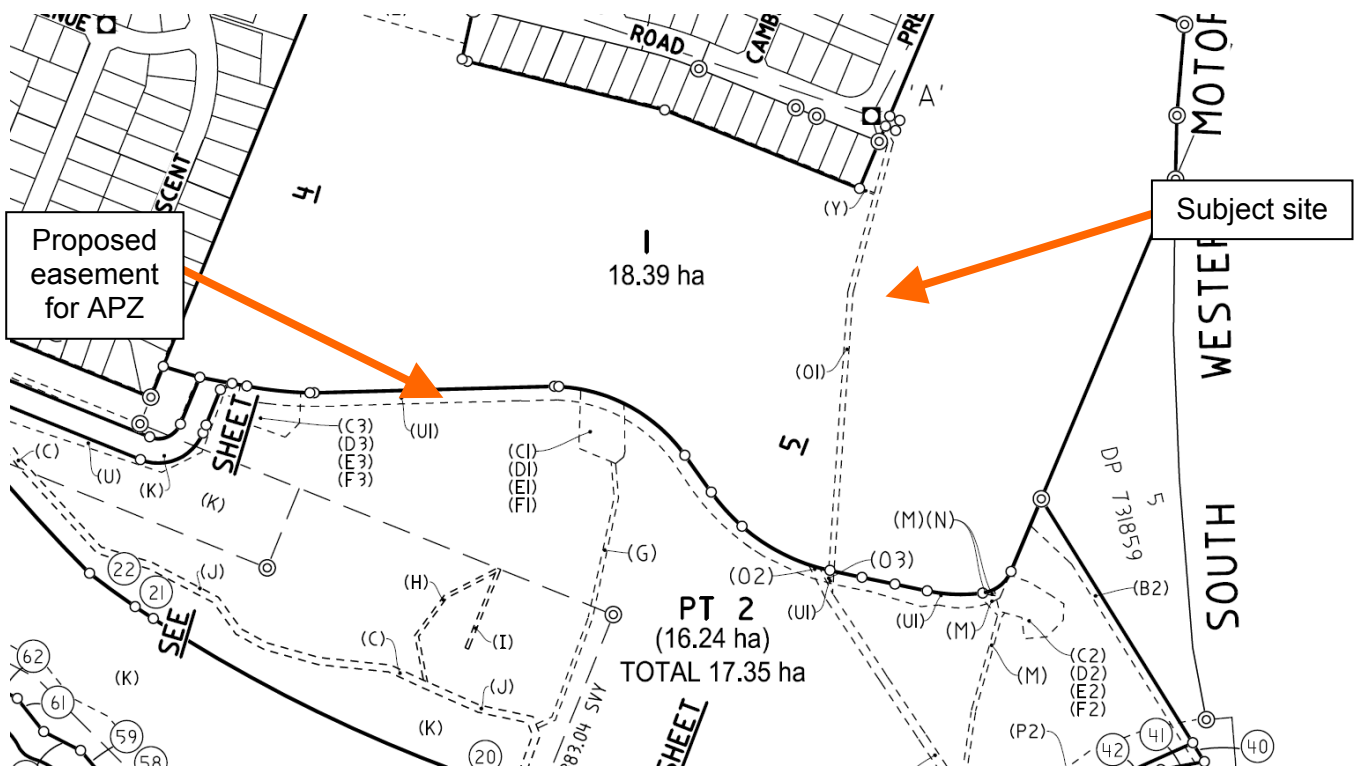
Extract from the Plan of Subdivision for DA-1107/2019 showing location of proposed easements
